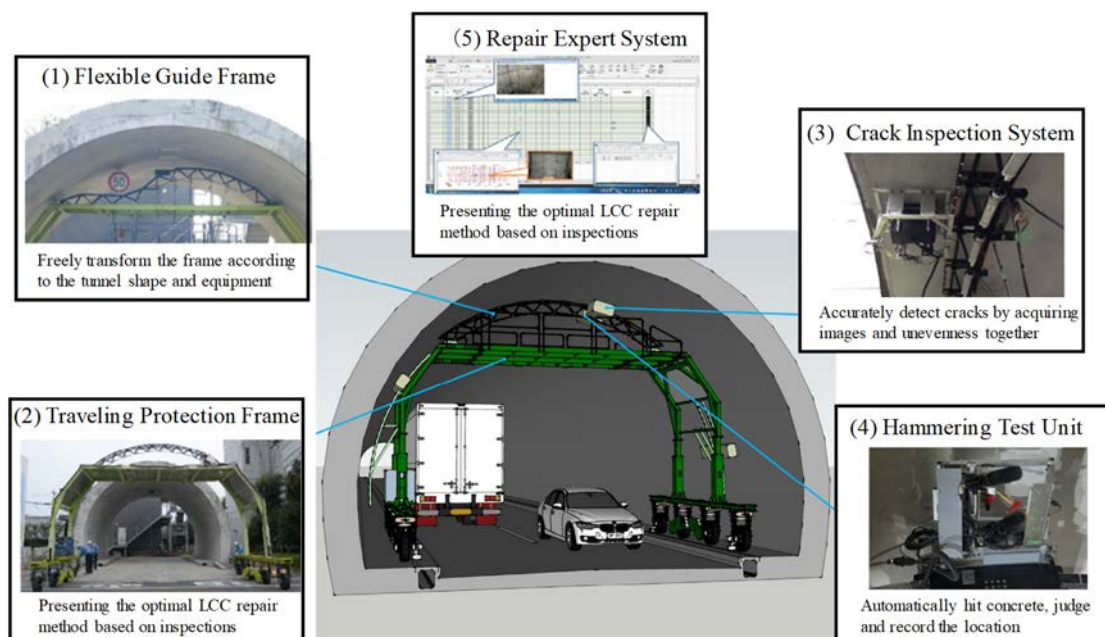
Overview of the tunnel inner wall inspection system and the introduced new technologies
